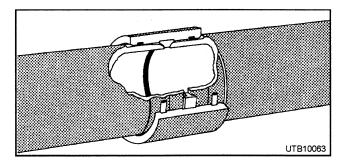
Cutaway view of a cement-asbestos pipe joint.
